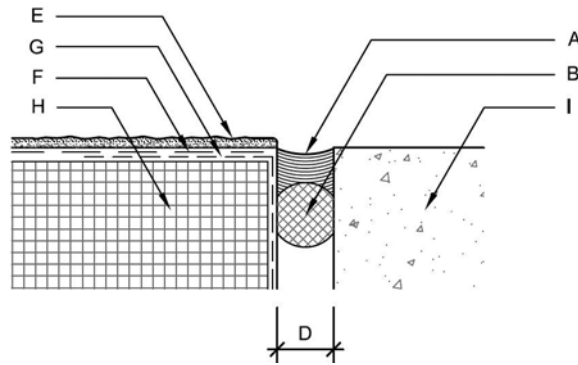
Sealant Butt Joint Seal (EIFS to Dissimilar Substrates)
